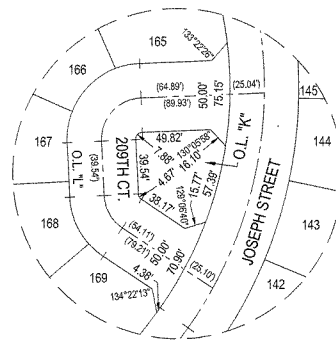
DETAIL "B" (JOSEPH STREET) NOT TO SCALE
